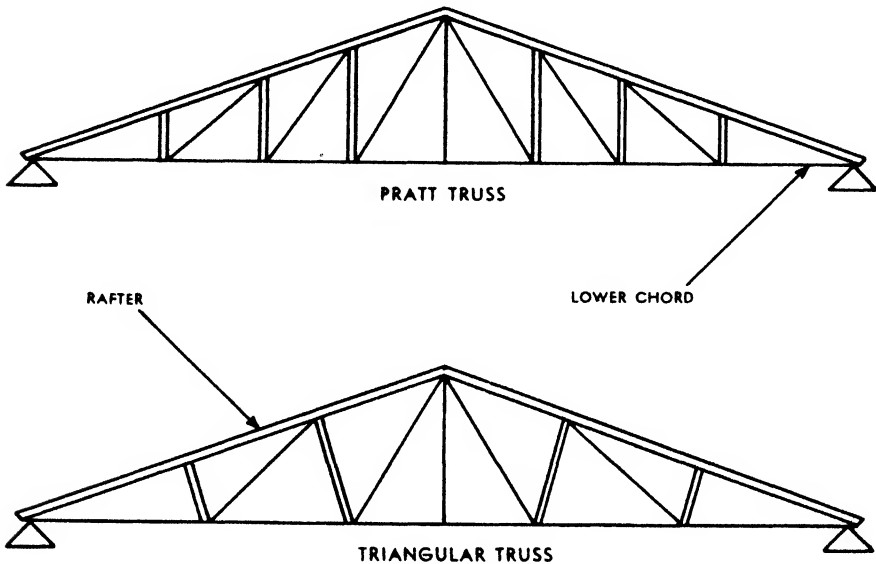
PRATT AND TRIANGULAR ROOF TRUSS.
